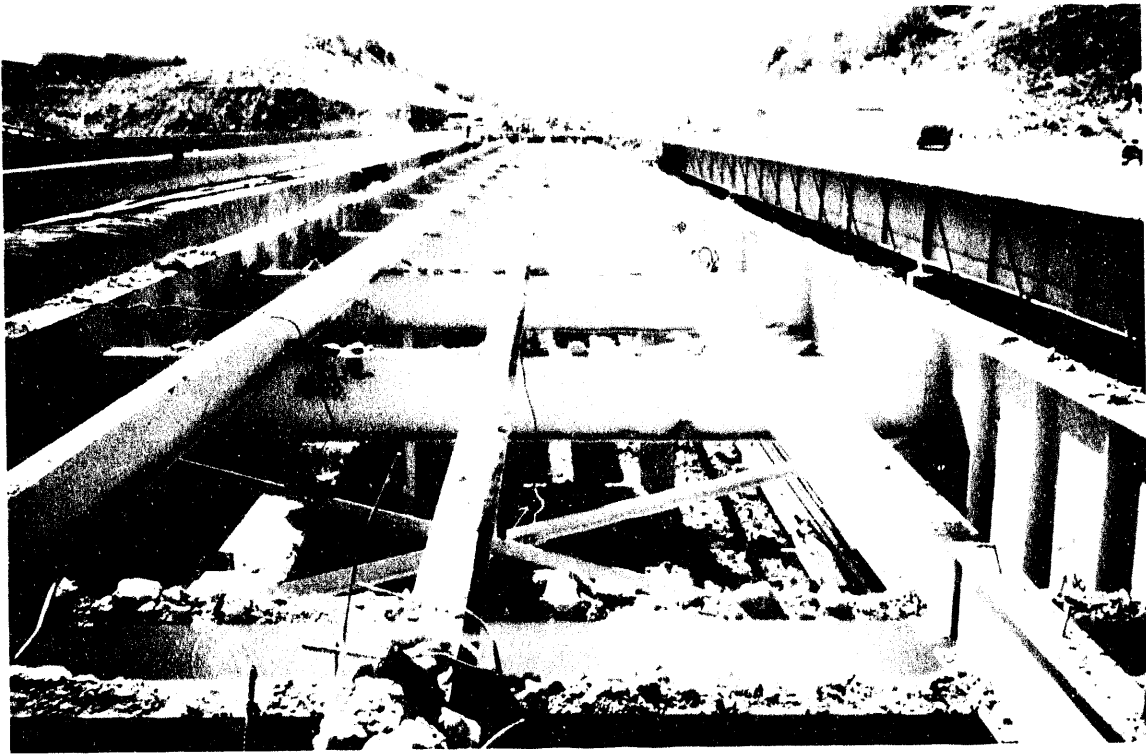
Top flanges of stringers and plate girders after the concrete deck has been removed. Note the lack of shear studs on these flanges.
